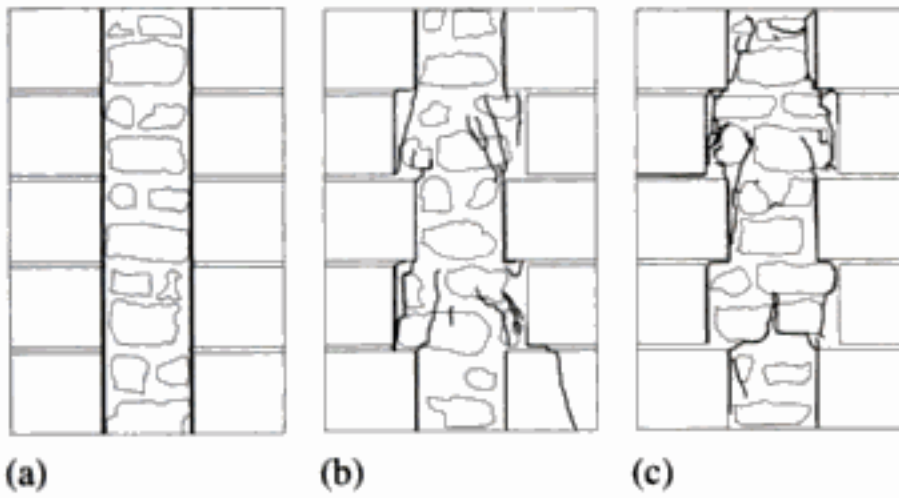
Typical ultimate crack patterns for (a) straight collar joints wallets (NS1) and keyed collar joints wallets: (b) Noto (NO1) and (c) Serena (SO2).
